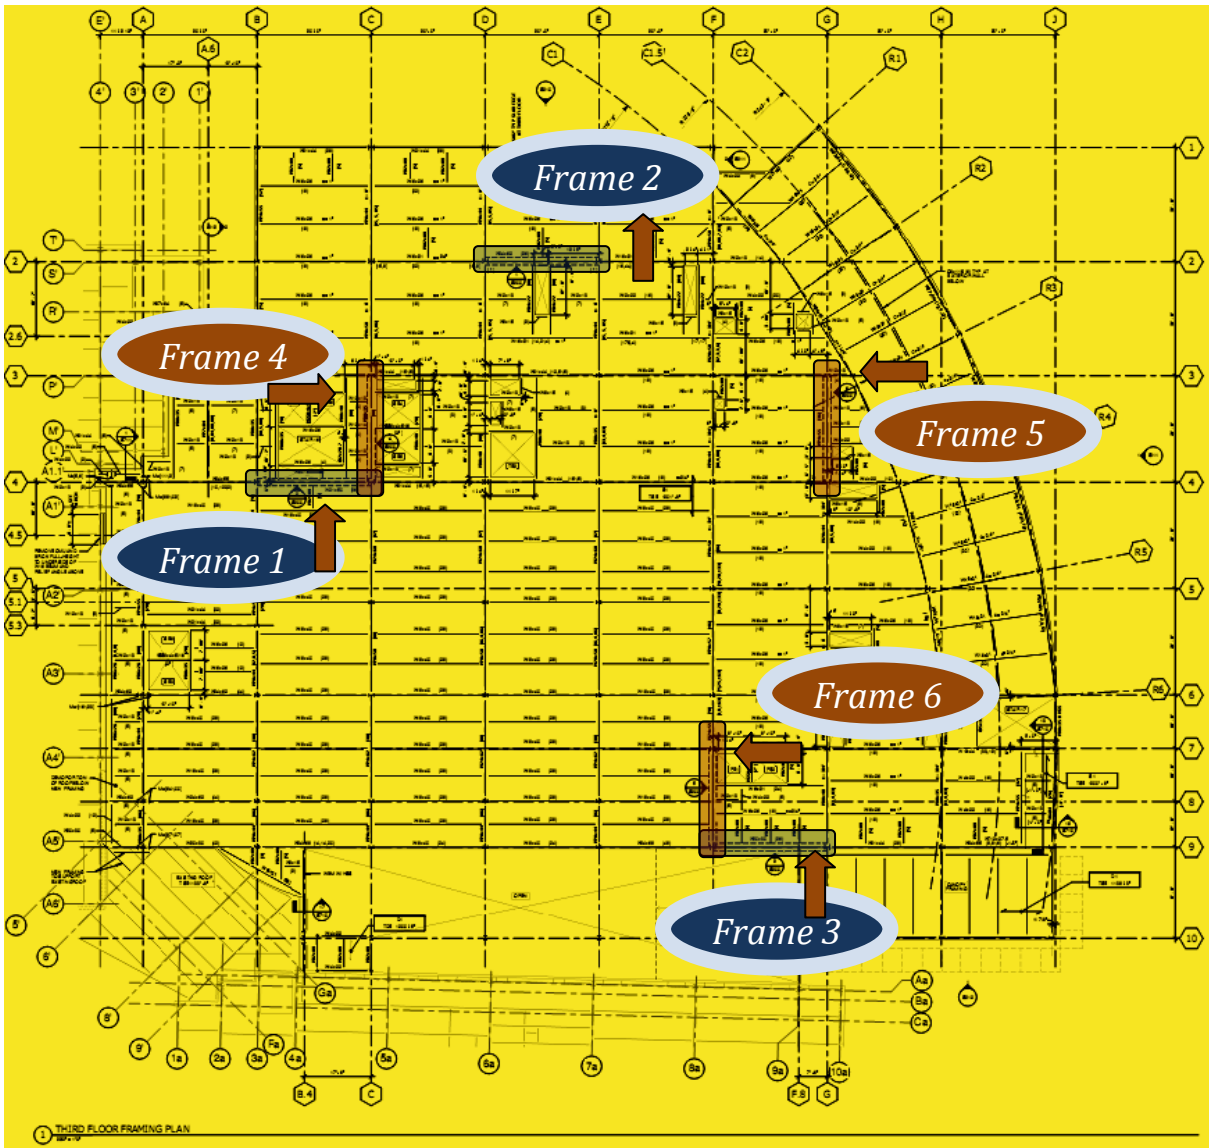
Third floor framing plan with braced frame locations shown. Typical bay sizes are 30'x30' or 30'x28'.
